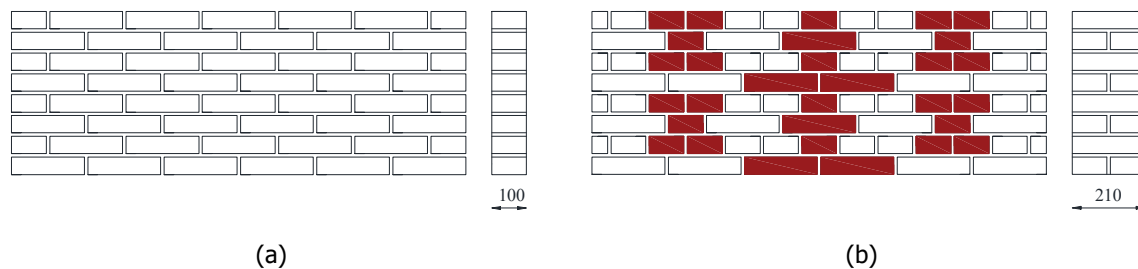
Adopted bond pattern: (a) Running bond pattern for the single wythe wall specimens; (b) Dutch cross bond pattern for the double wythe wall specimens (dimensions are in mm).
